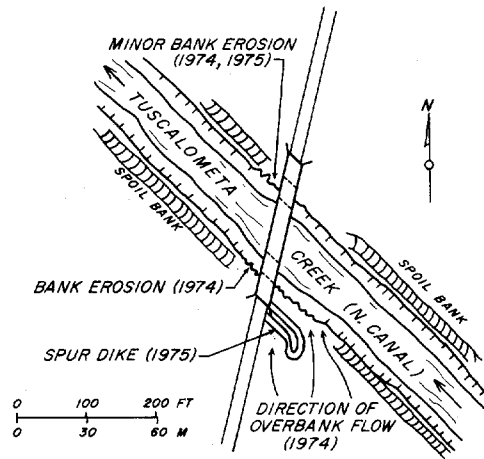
Plan sketch of north canal at SR-35 crossing, showing countermeasures.
